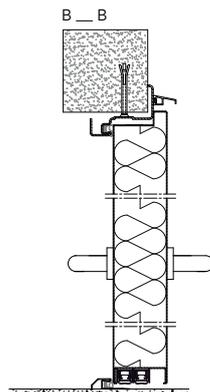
Vertical cross-section of the ECO Tech external seamless steel door with a corner frame
